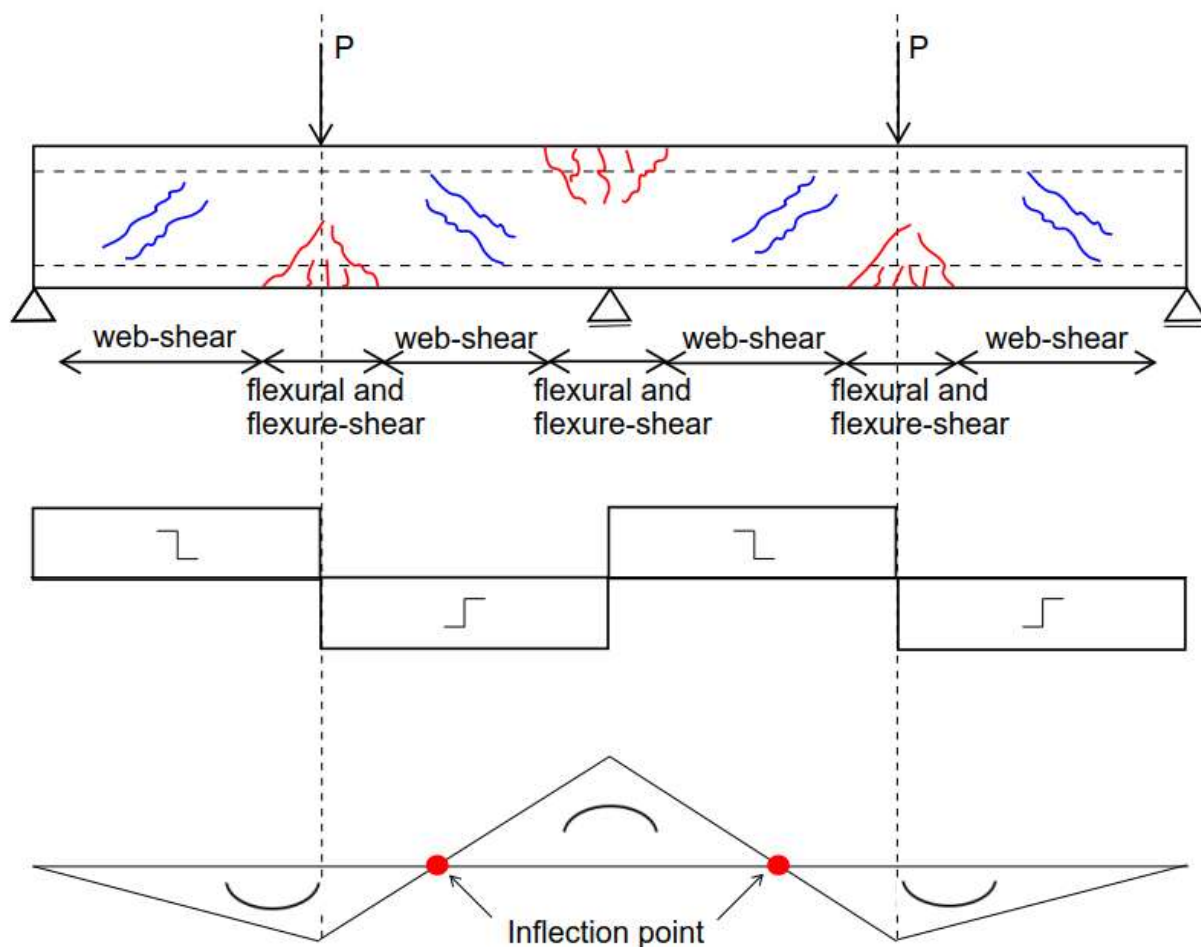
Crack patterns for prestressed continuous concrete members
